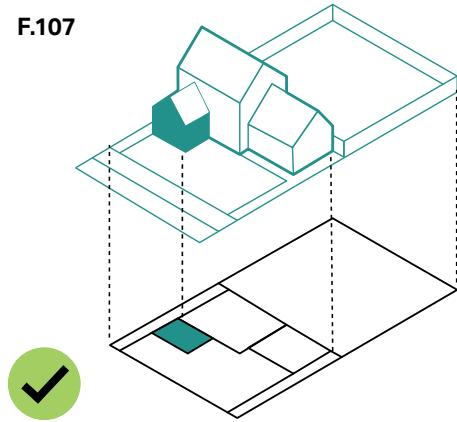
An acceptable example of a front extension which is smaller in scale than the existing building, mirrors the roof pitch, and covers less than 50% of the front elevation.
